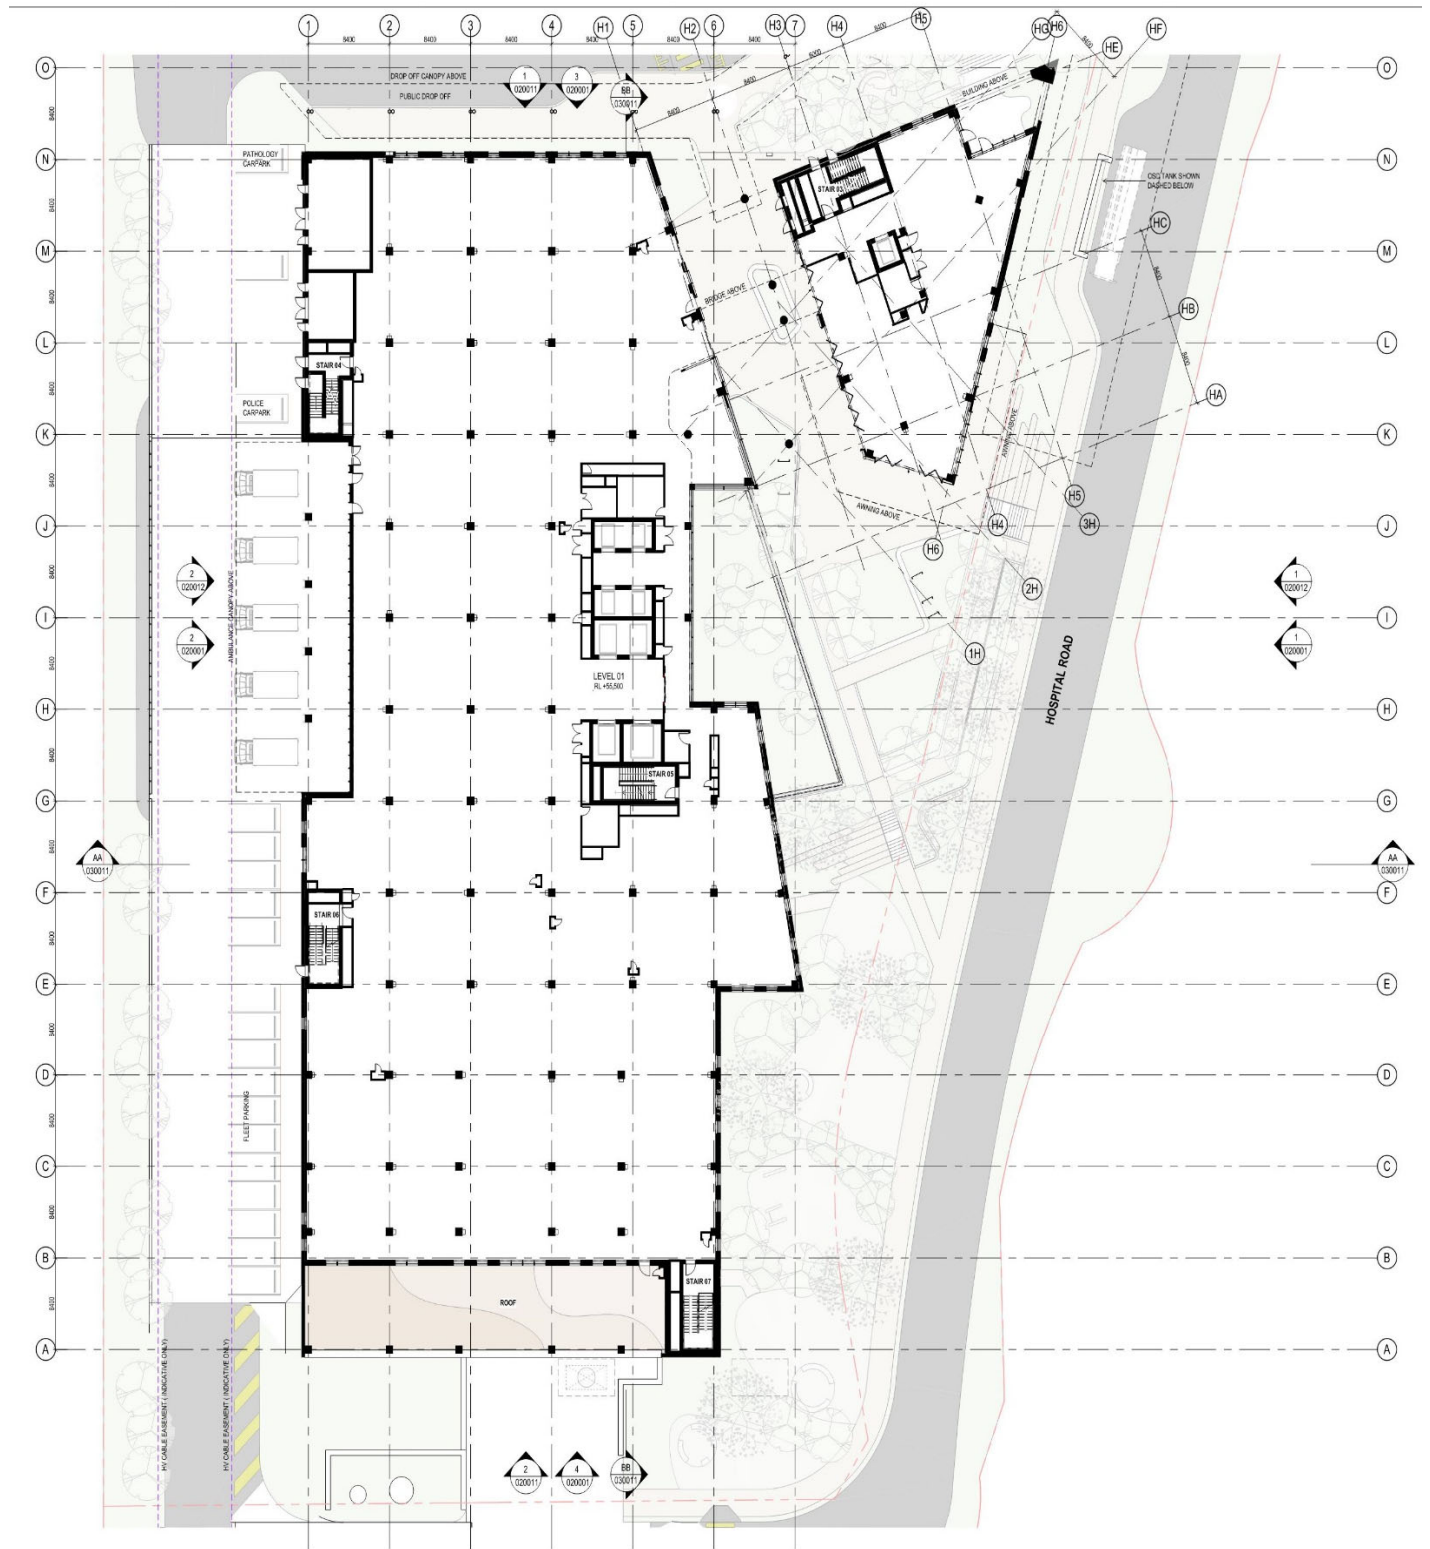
Level 01 – General arrangement plan (source: HDR, 07/08/2025)
